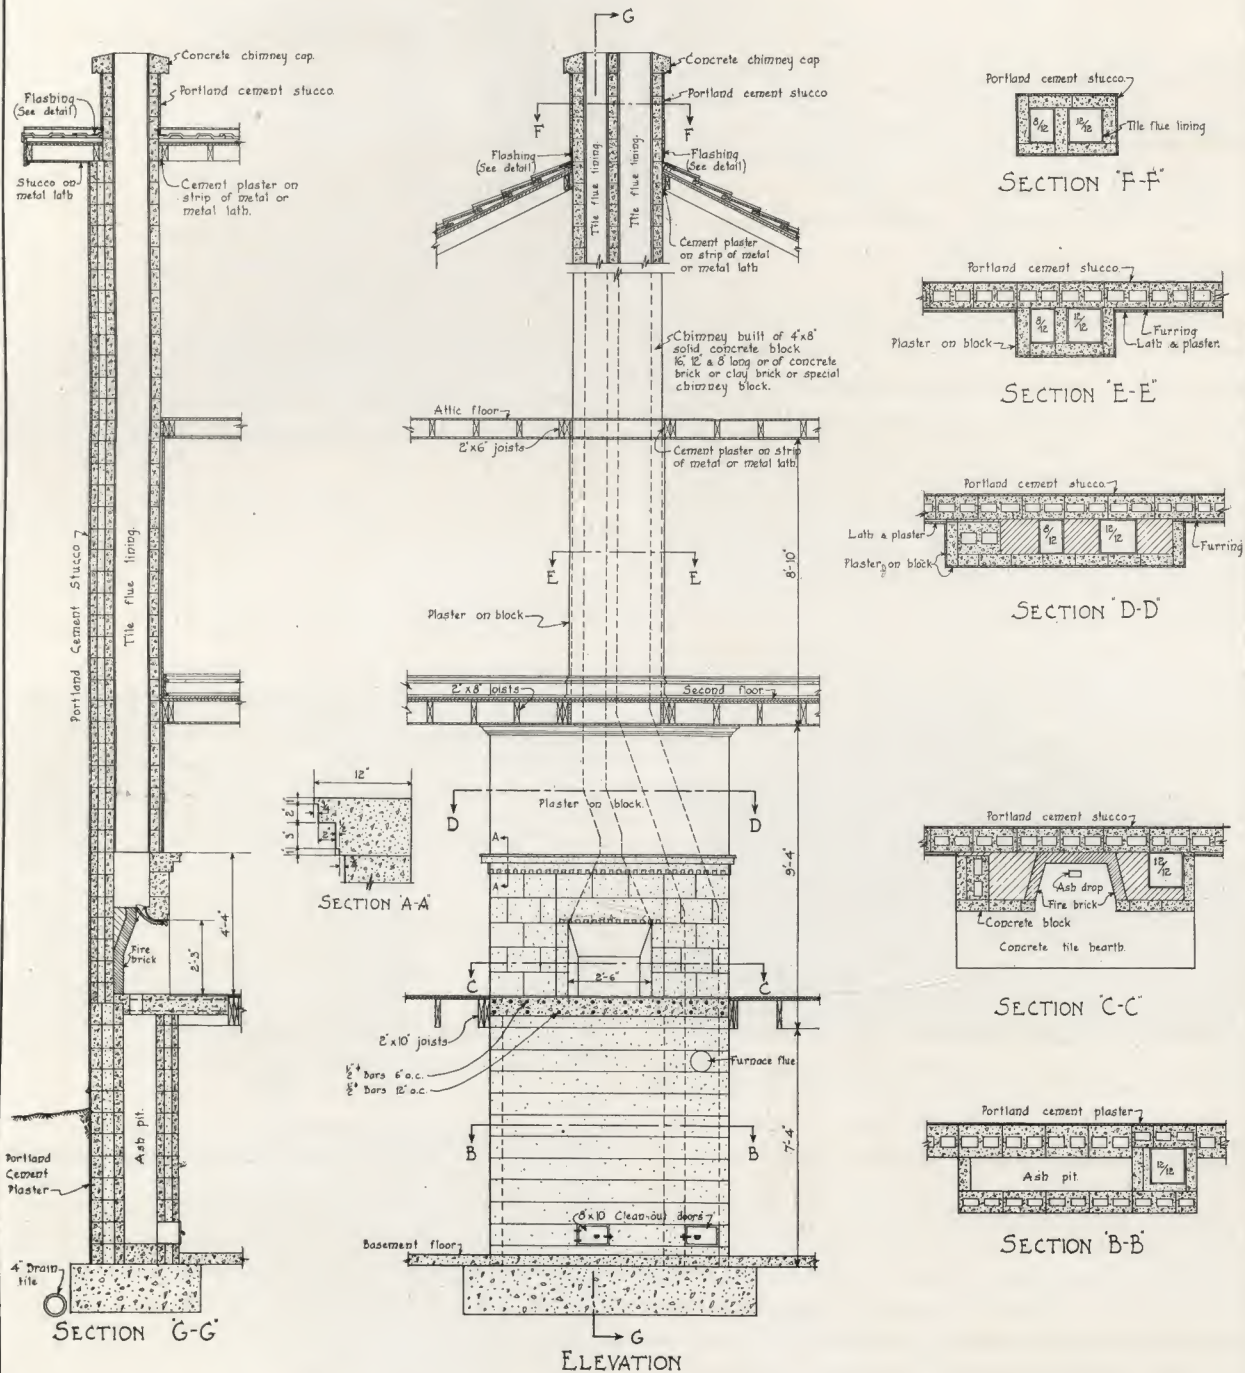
Typical chimney construction details. A wide footing to sustain the weight of the chimney without settlement, chimney block carefully laid in cement mortar with joints well filled and flashing at roof to keep out moisture, are essentials of good chimney construction.
